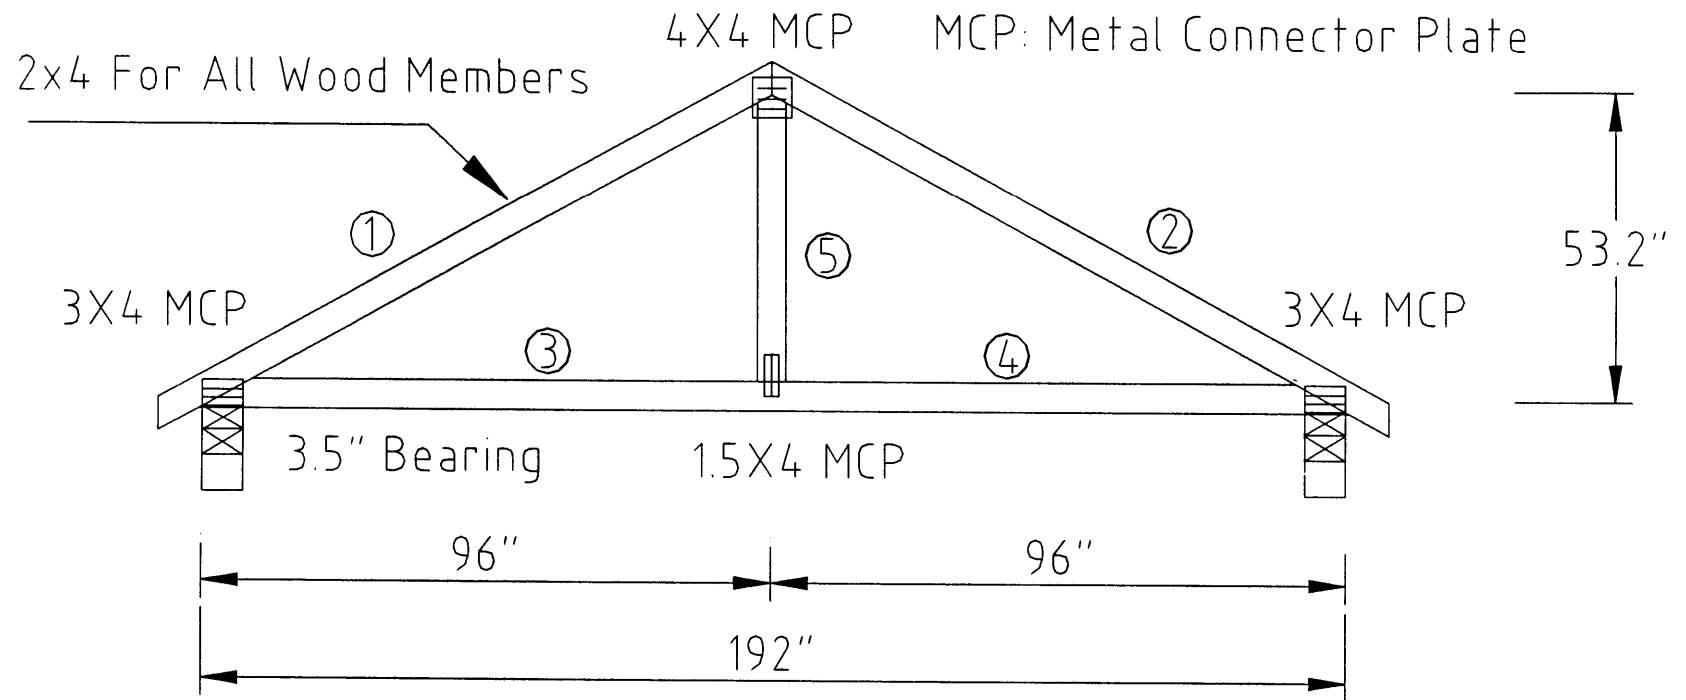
MPC Truss Type B from a Truss Plate Manufacturer
